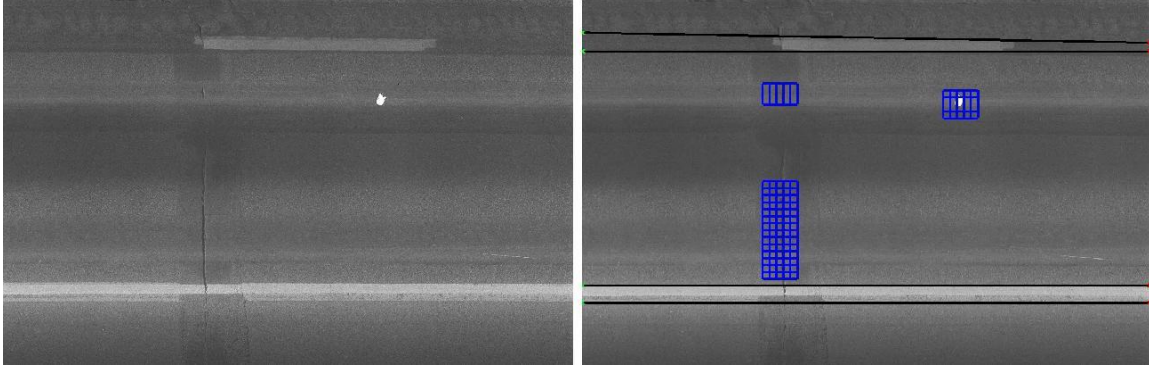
Example 2 of high-severity asphalt pavement crack: raw crack (left) and crack detection (right)
